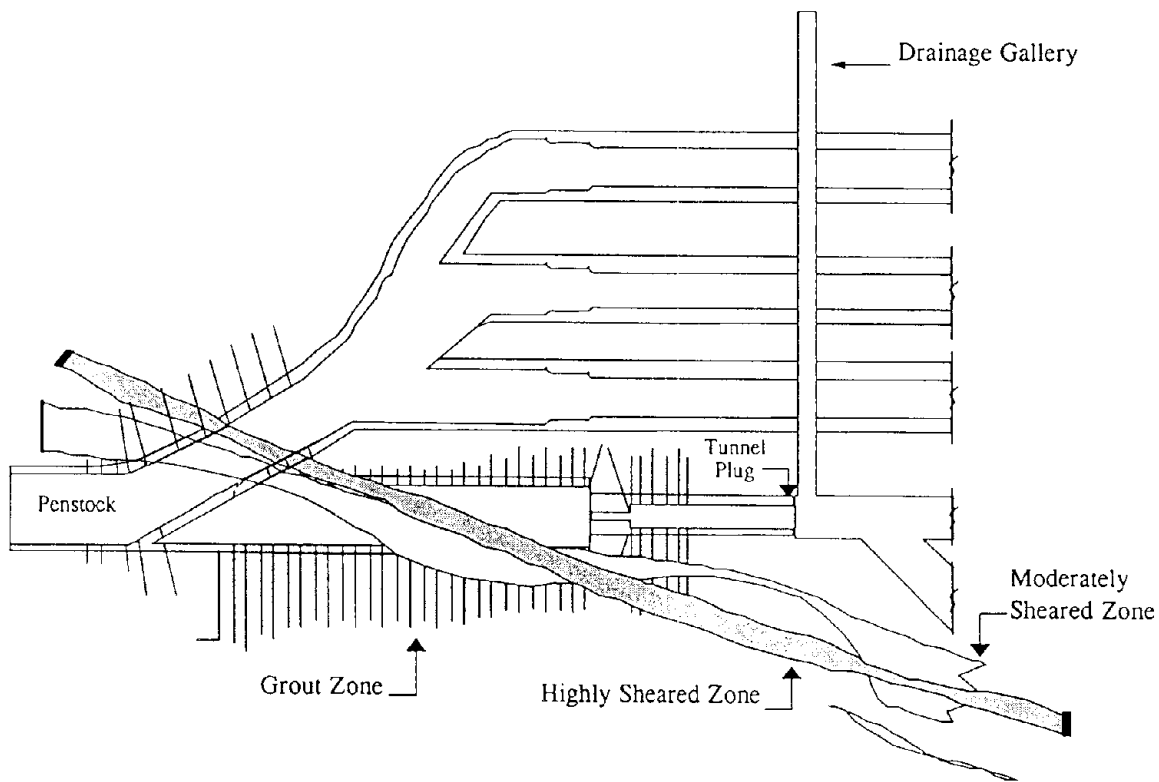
Plan view showing location of shear zone west of powerhouse station.
